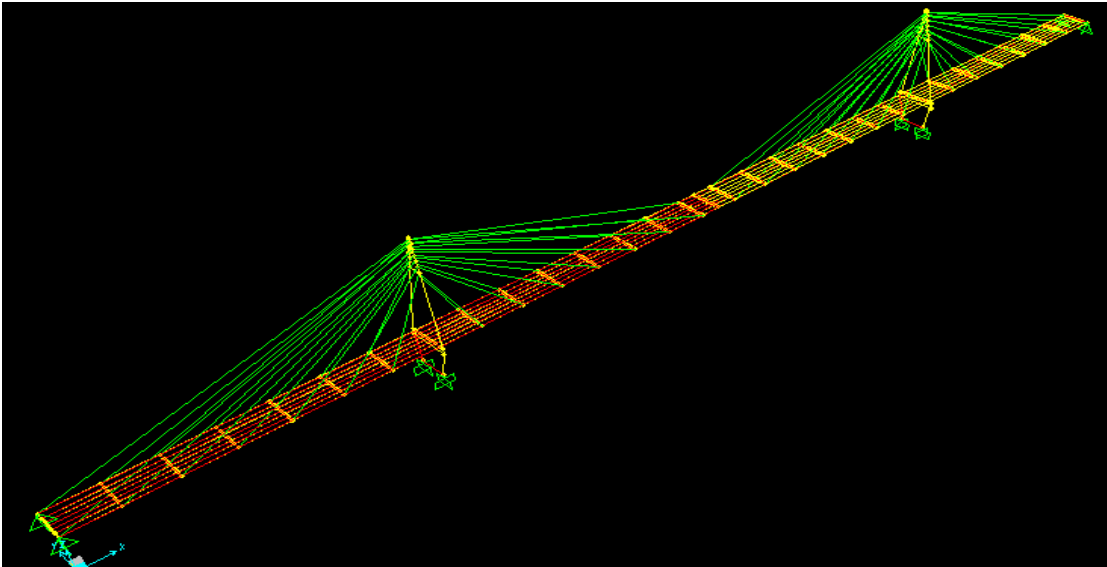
3-D finite element model of Diamond shaped pylon cable-stayed bridge
